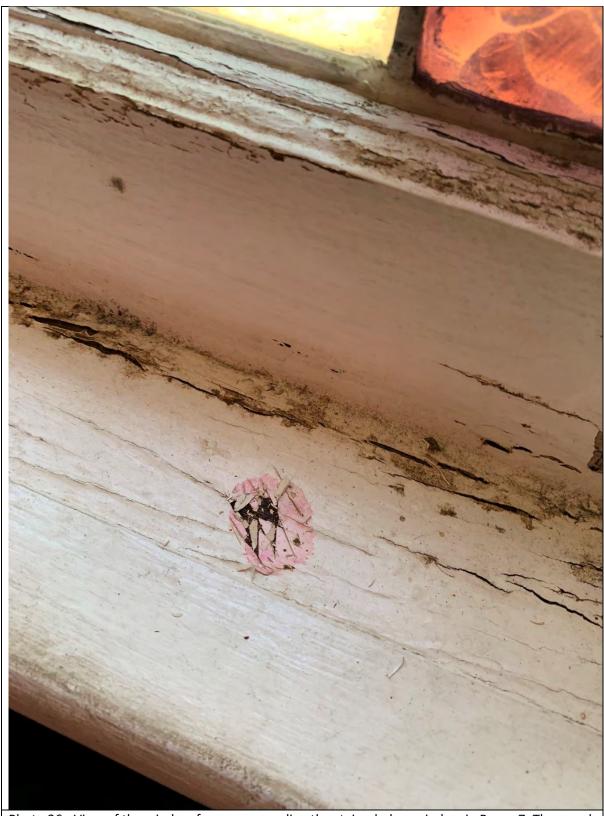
View of the window frame surrounding the stained-glass window in Room 7. The wood window frame is covered with white lead-based paint.
